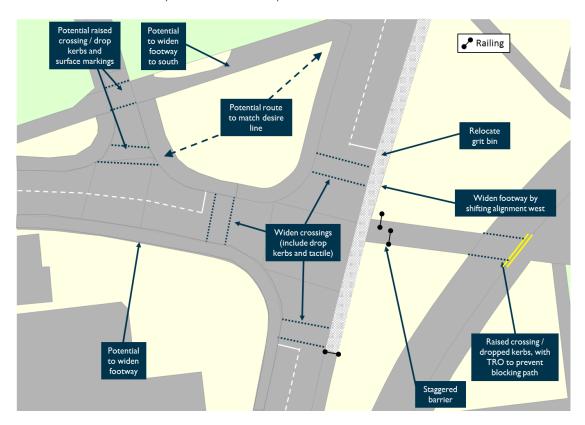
Grange Road / Haddington Road Junction Layout Considerations
